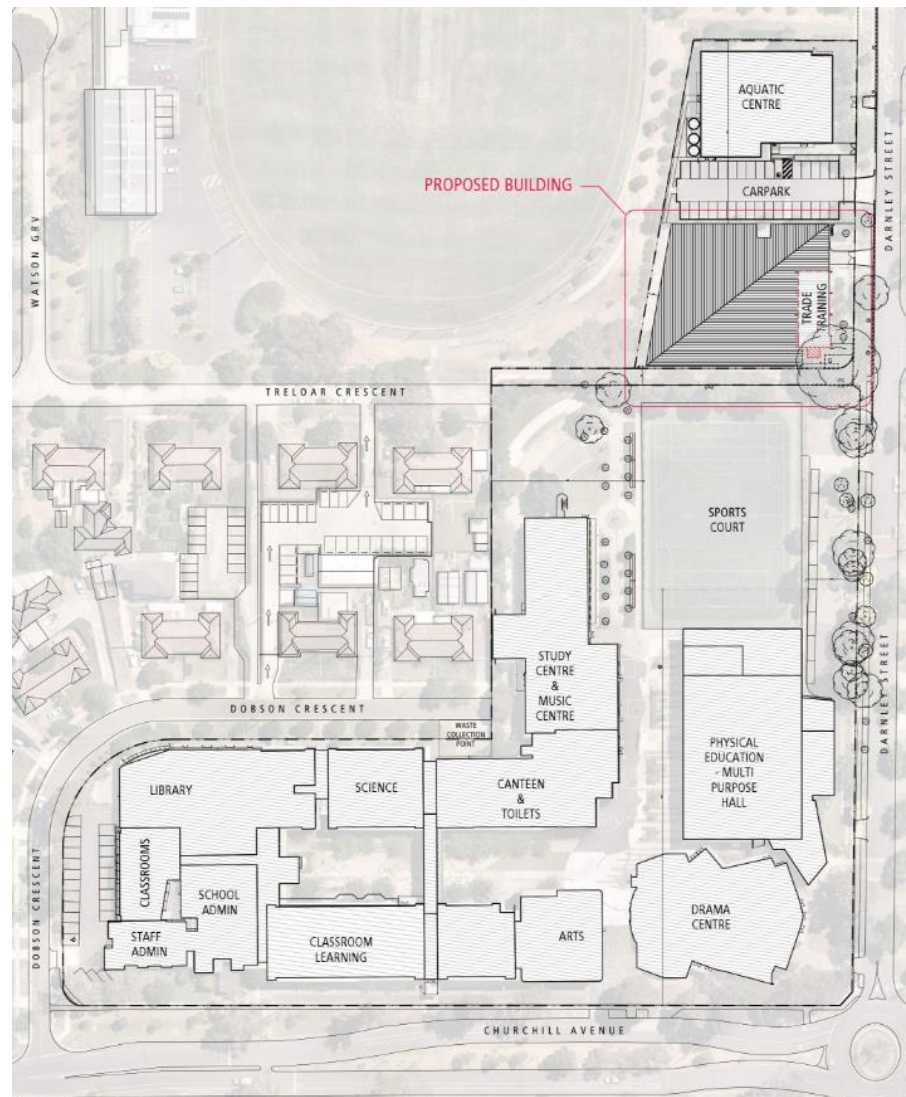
Proposed Site Plan (source: Watson Young Architects)
